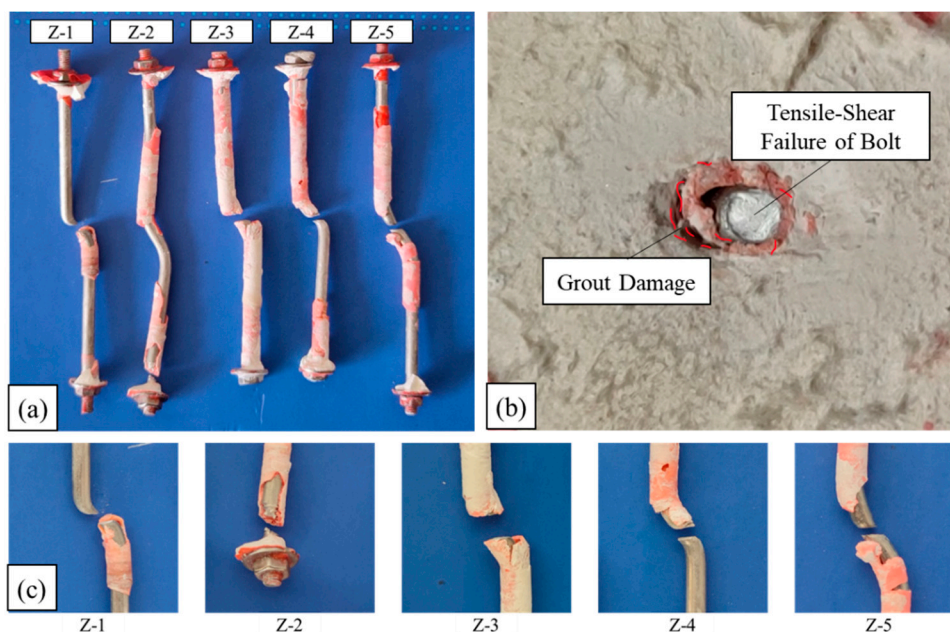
Failure characteristics of fully grouted bolts at rock joints: (a) overall failure modes of bolts in the fully anchored condition; (b) localized tensile-shear fracture of the bolt at the rock joints; (c) detailed views of the bolt fracture morphology.
